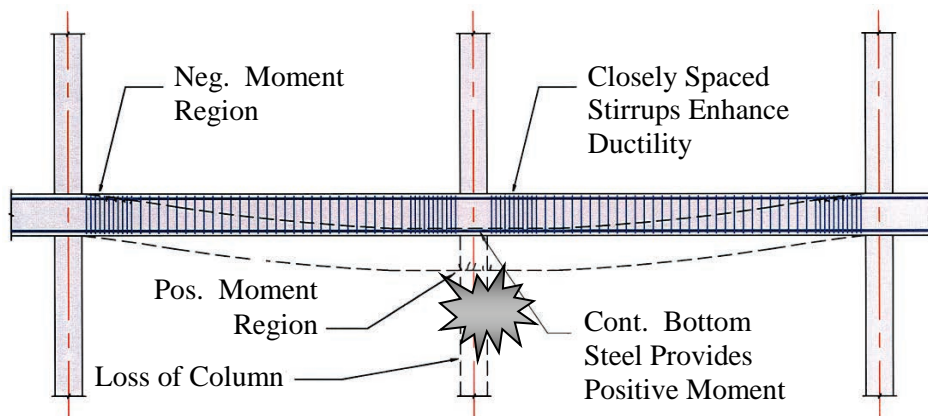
Detailing of reinforcing steel in a beam for potential loss of a supporting column.
